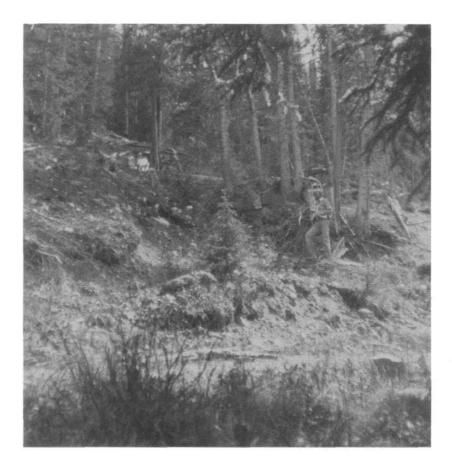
Multiple scarps above an old drill location access road at about Sta. 145+00 in the "tenderloin" area.
